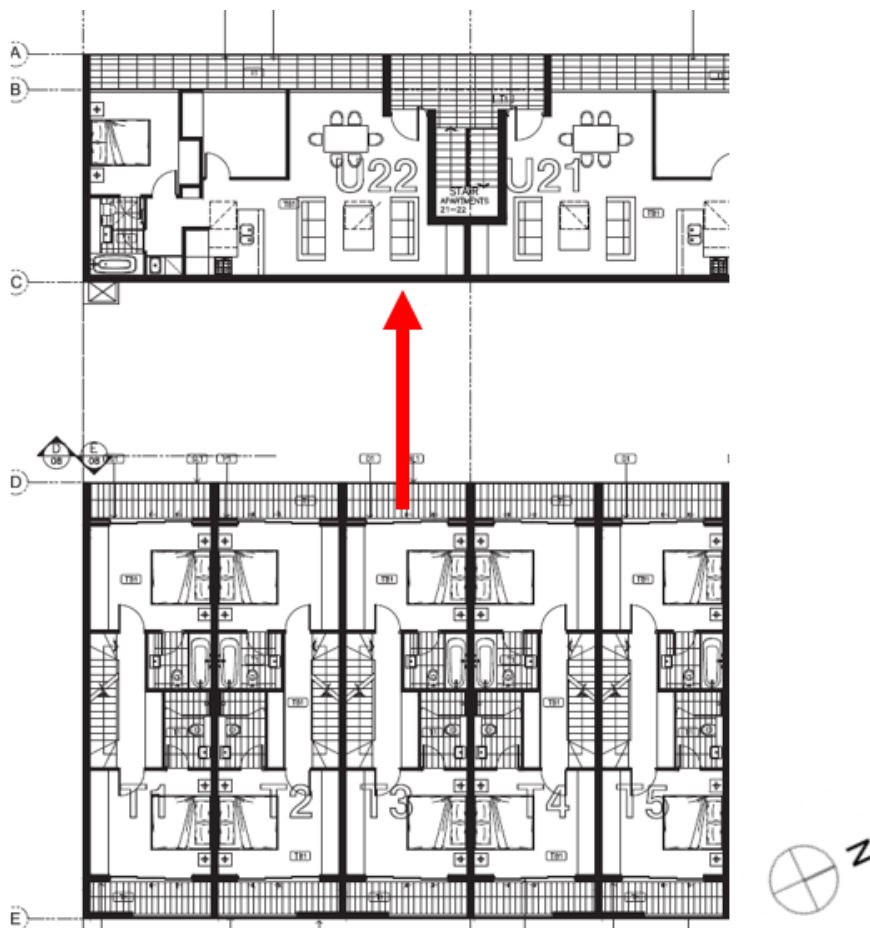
approved floor plans for apartments within 1-9 William Street, showing balconies facing blank walls opposite
